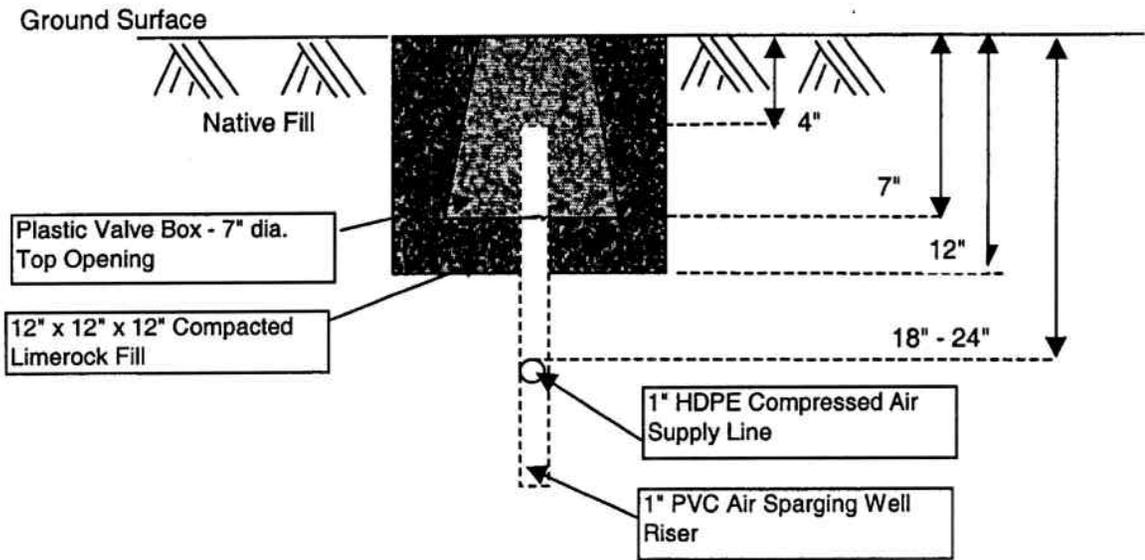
Exhibit B - Cross-Sectional Detail of Valve Box at Air Sparge Well Head
